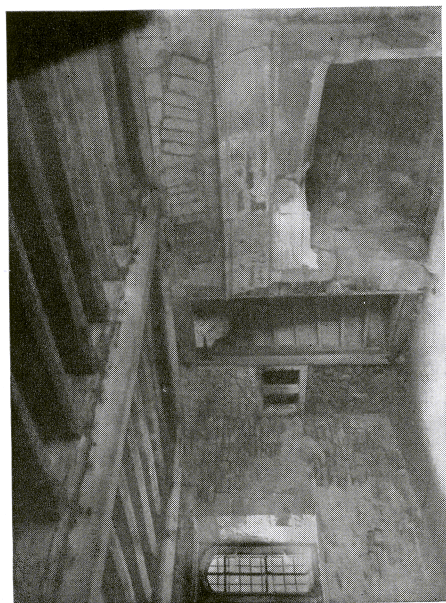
PLATE IIa. Interior—fireplace and staircase in south ground floor room, from south-east.
